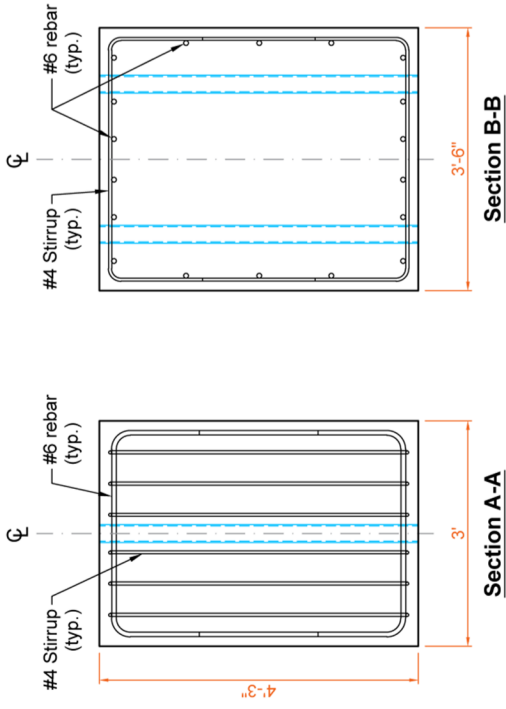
Phase 1 Test Building: RC Footing 1 (for Cantilever Columns)
